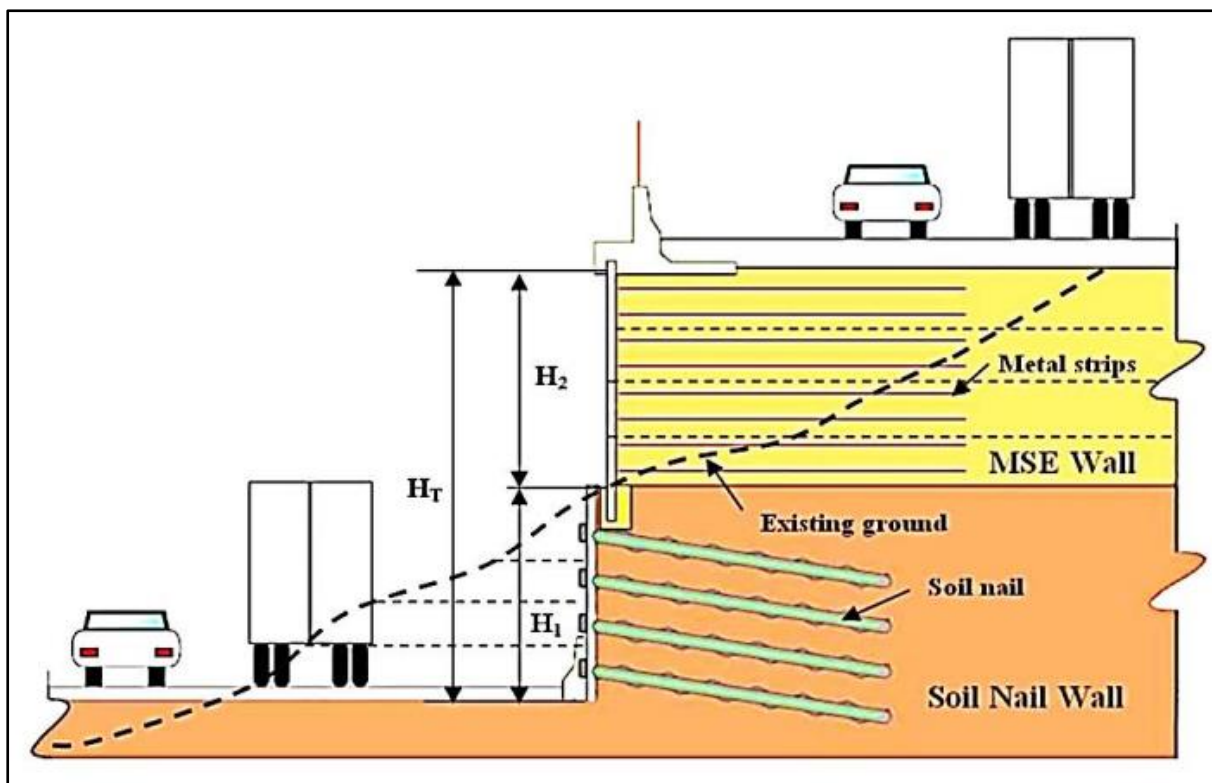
Hybrid Soil Nail/MSE Wall (Lazarte, et al., 2015)
